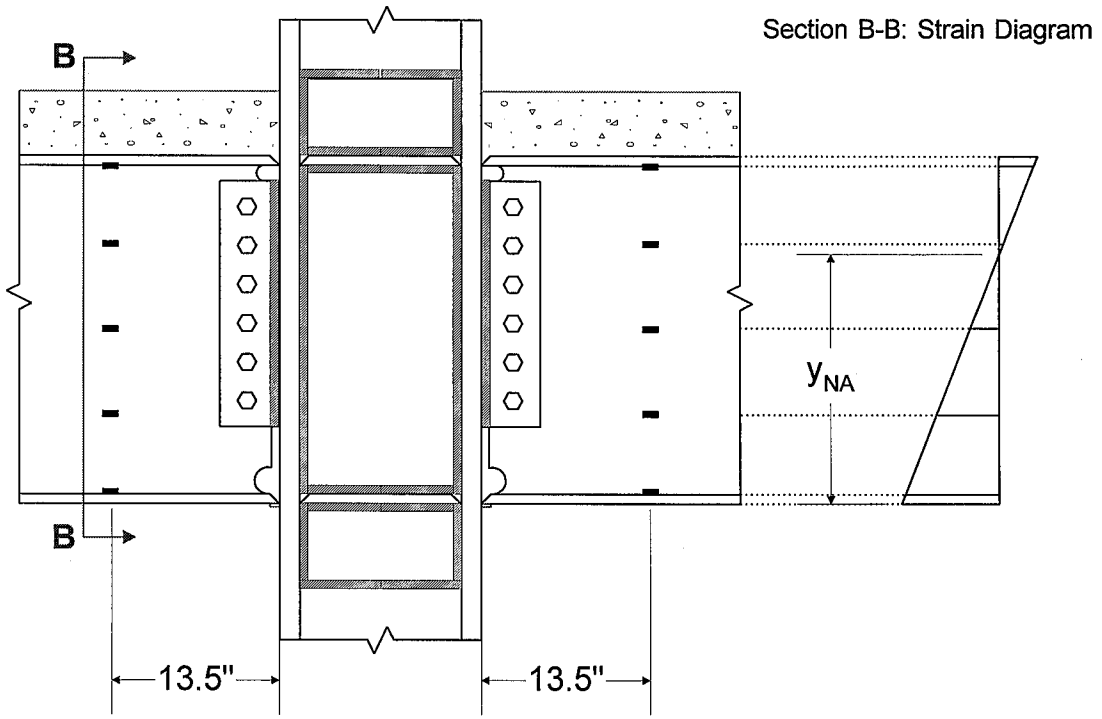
Strain Gages Along the Steel Girder Cross Section
